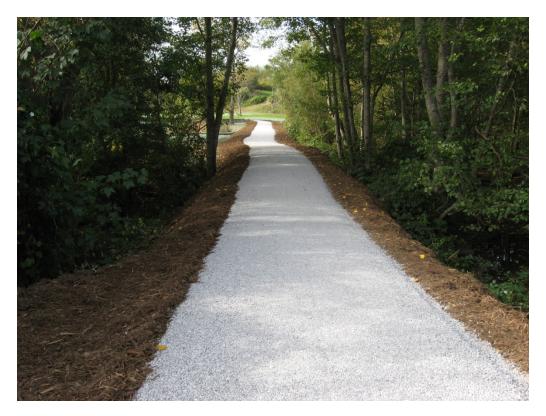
Finished trail entering Little Squalicum Park from Bellingham Technical College.
